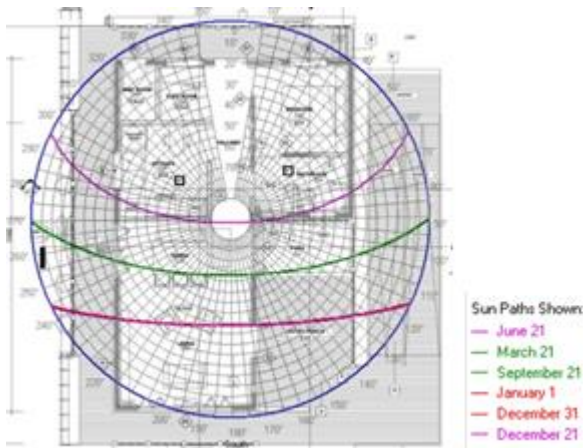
Floor plan and sun path of Mizan Home using Autodesk Revit
